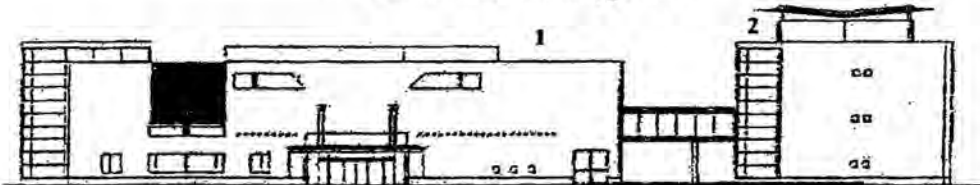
Elevation of the STRC showing the bridge linking between the first floors of the general facilities building and research laboratory wing
